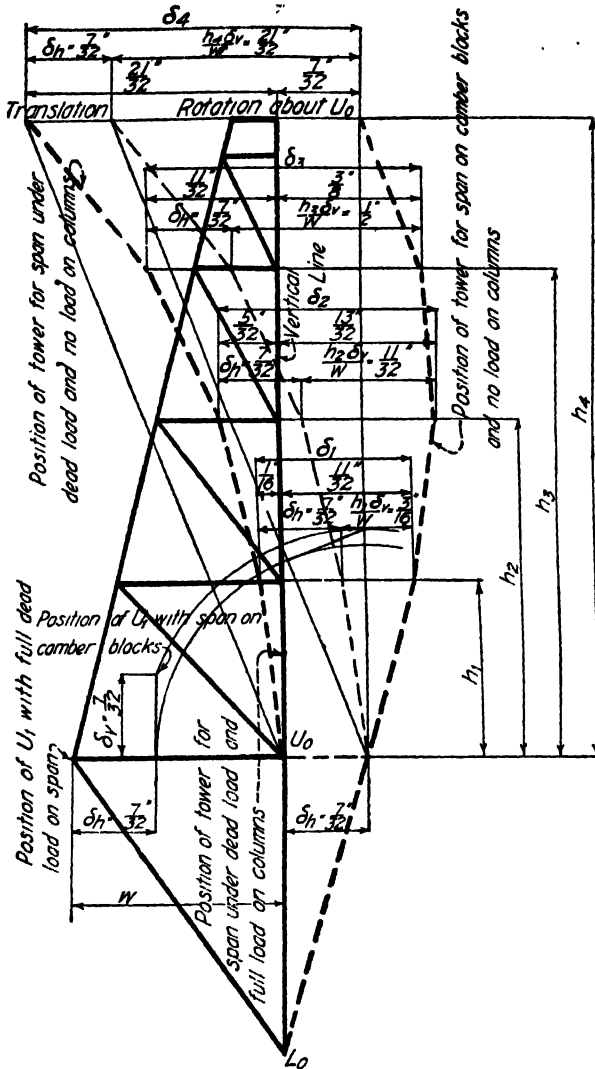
Camber Diagram for Tower of Vertical Lift Bridge.
